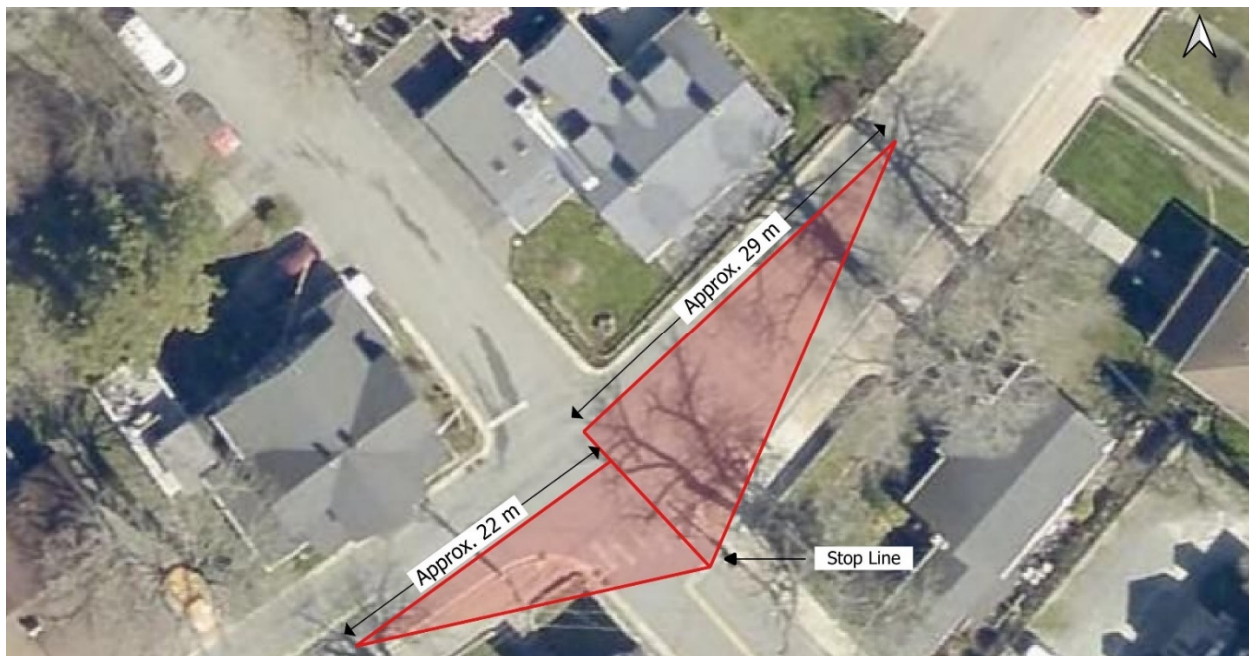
Intersection of Main Street & School Street - NB Approach
